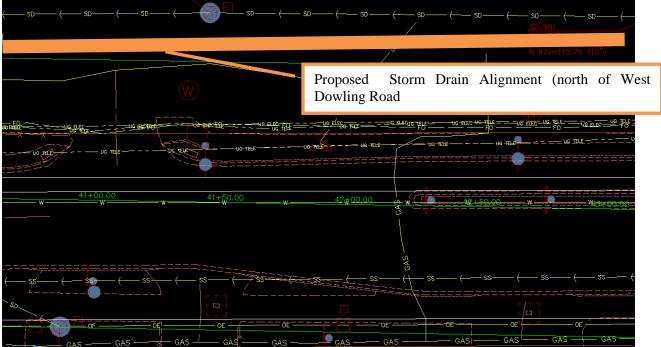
Sample Section of West Dowling Road between Campbell Creek and Old Seward
